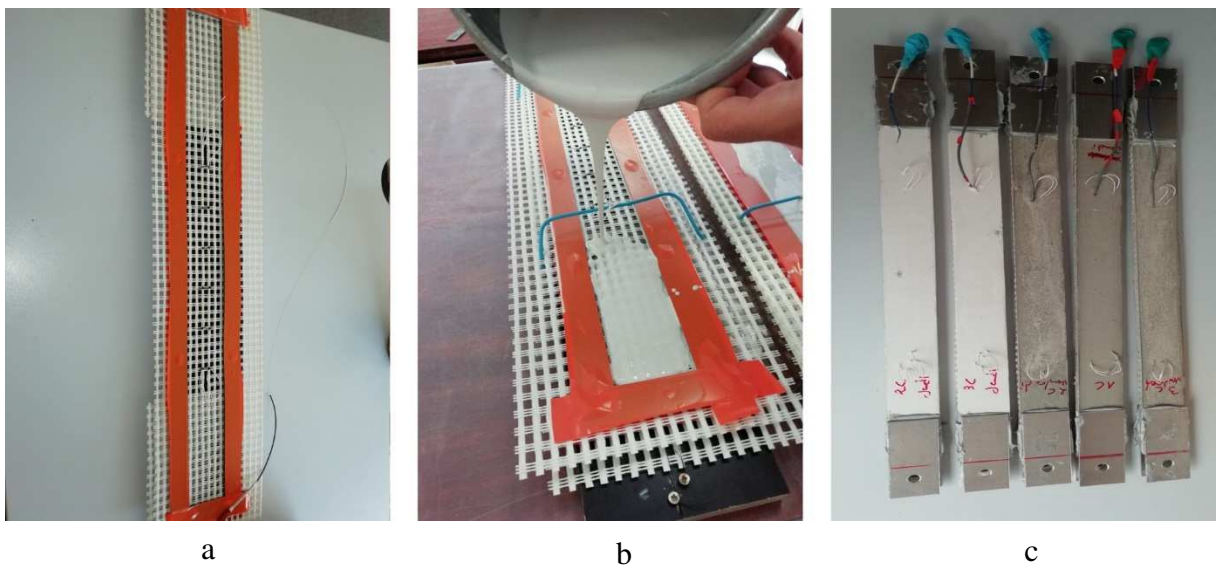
Preparation of TRCMC specimens: (a) preparation of mould with optical fibre, (b) pouring of matrix, and (c) demoulding and bonding of aluminium plates.
